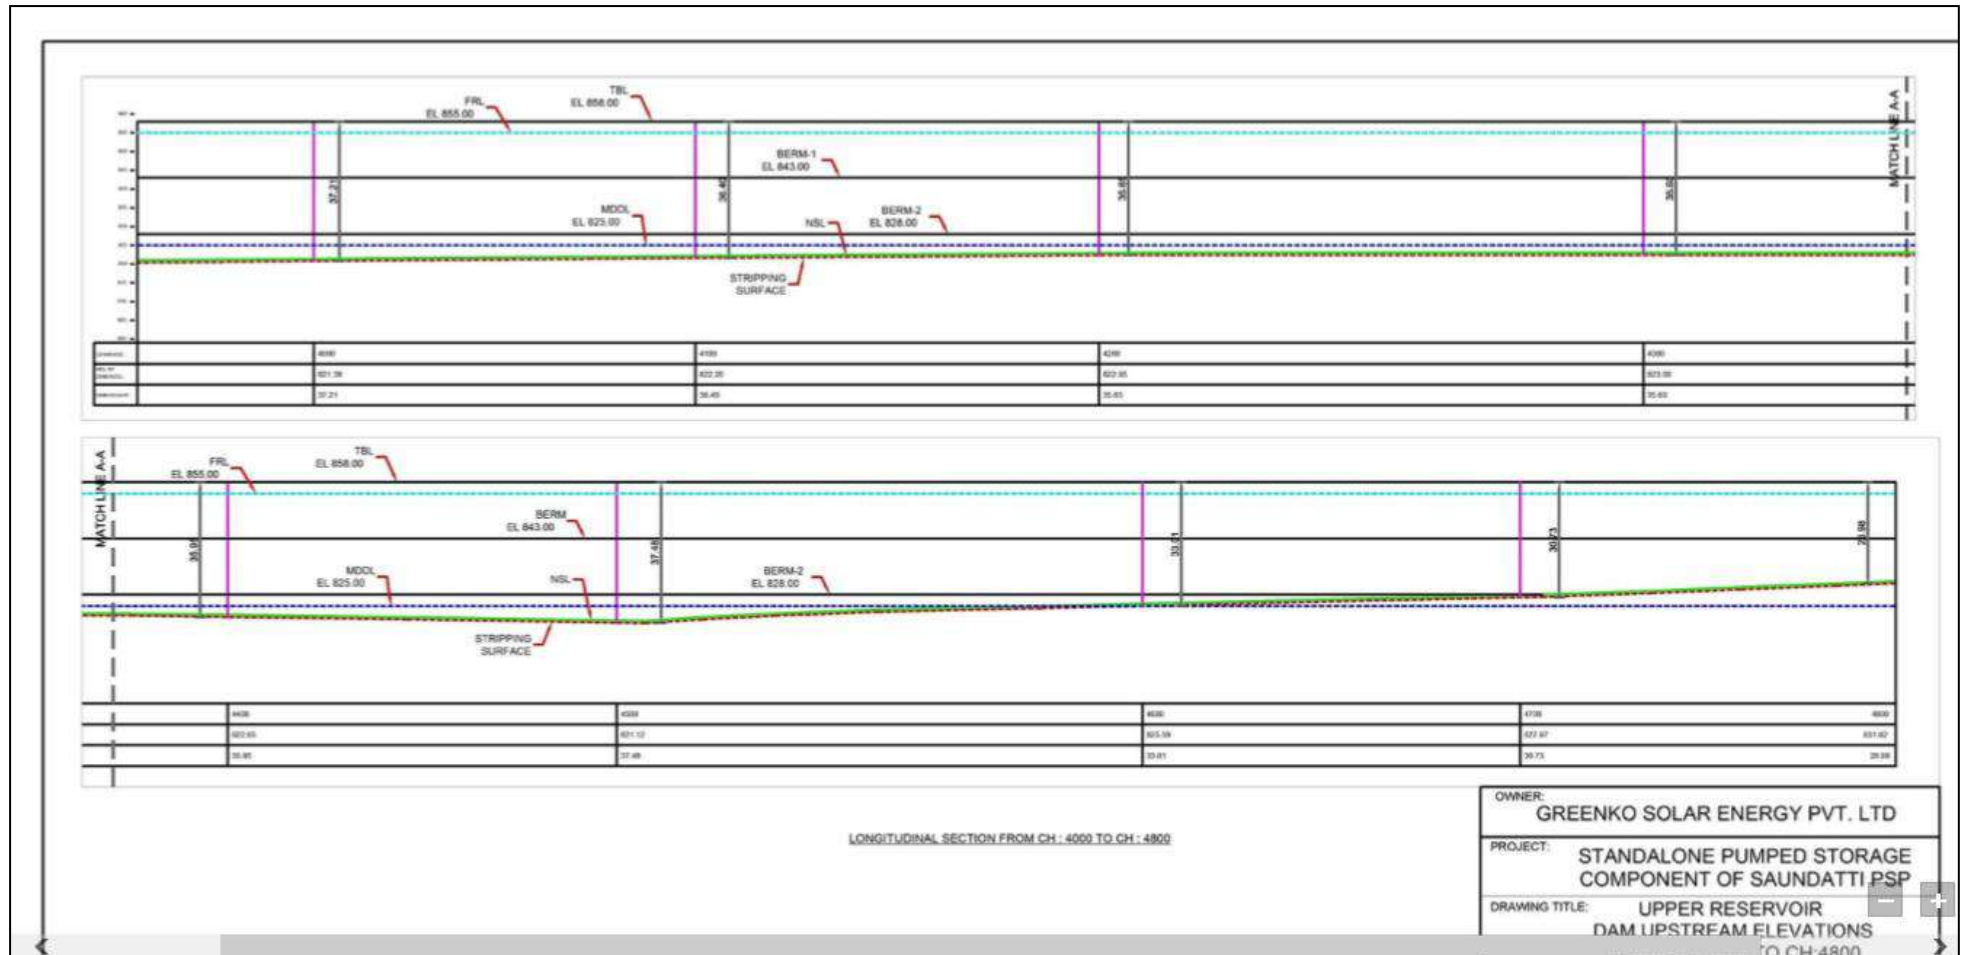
B: Upstream Elevation view of dam /embankment (SCENARIO 2)
